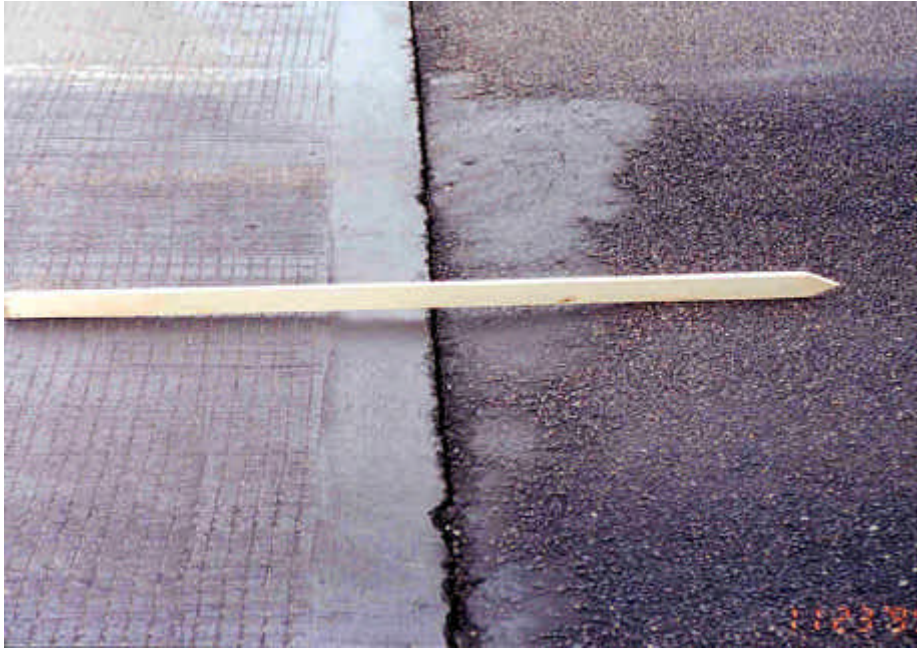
Experimental Section 1999 EB - asphalt to approach slab - dip.
